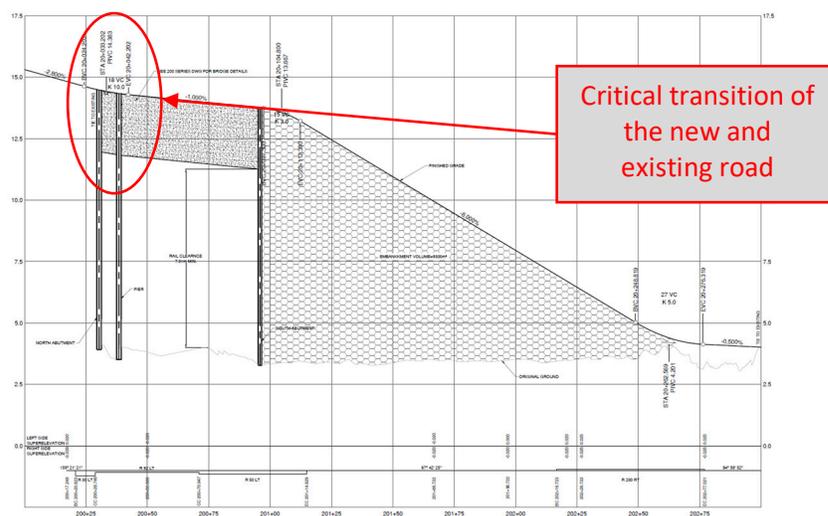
Final roadway design depicting transition of the new roadway design on the bridge with a steeper slope at the existing MSE wall at North
